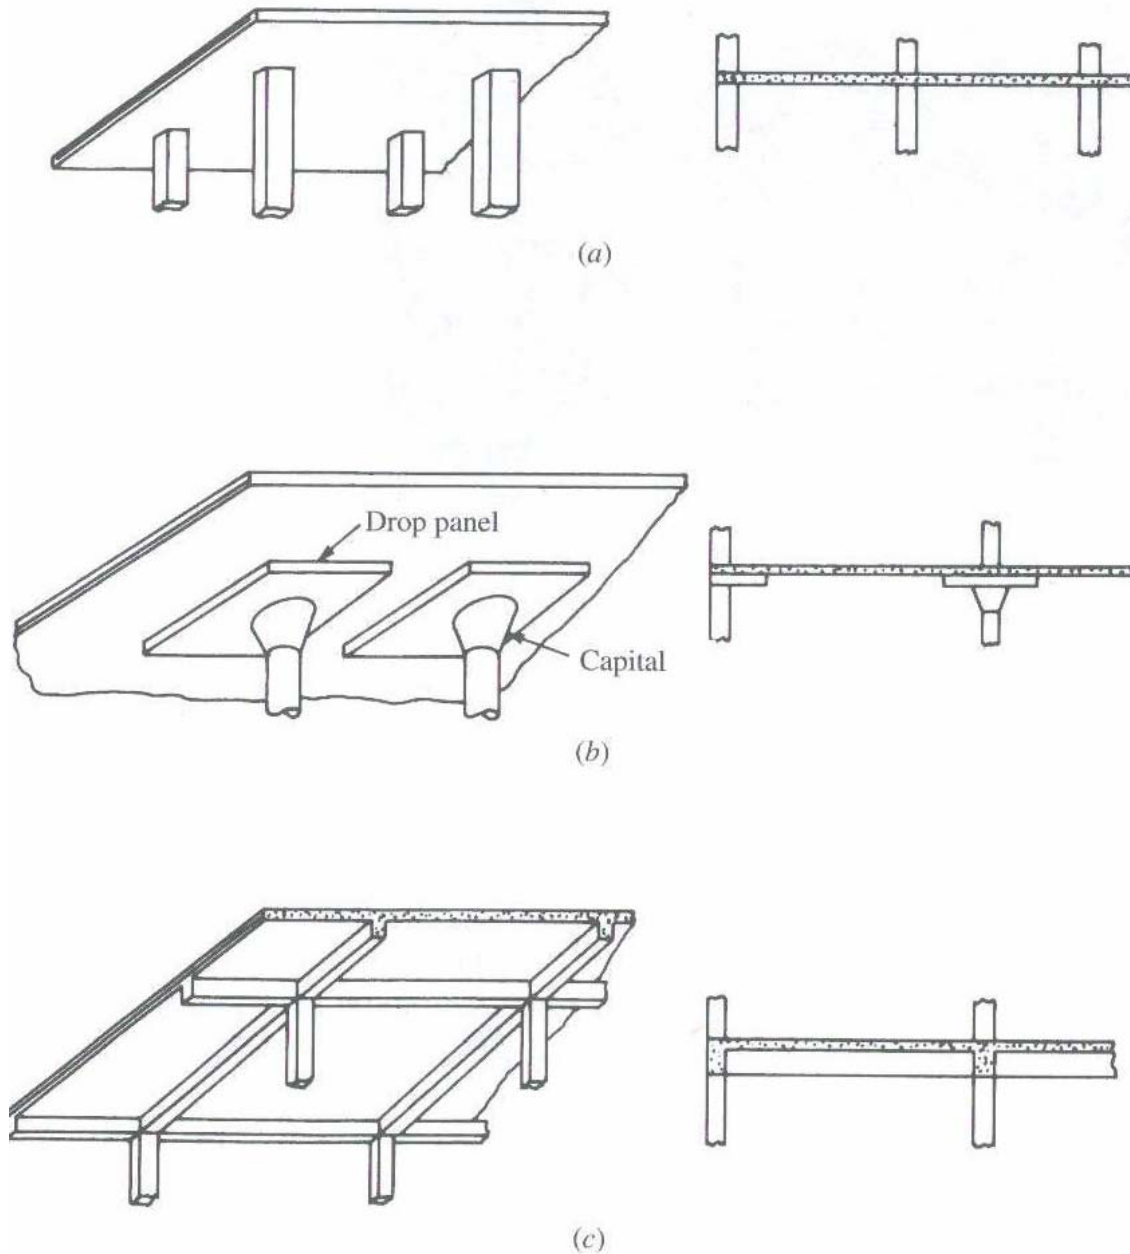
Two-way slab systems: a) flat plate, b) flat slab, c) slab stiffened with beams on column centerlines. [5]
